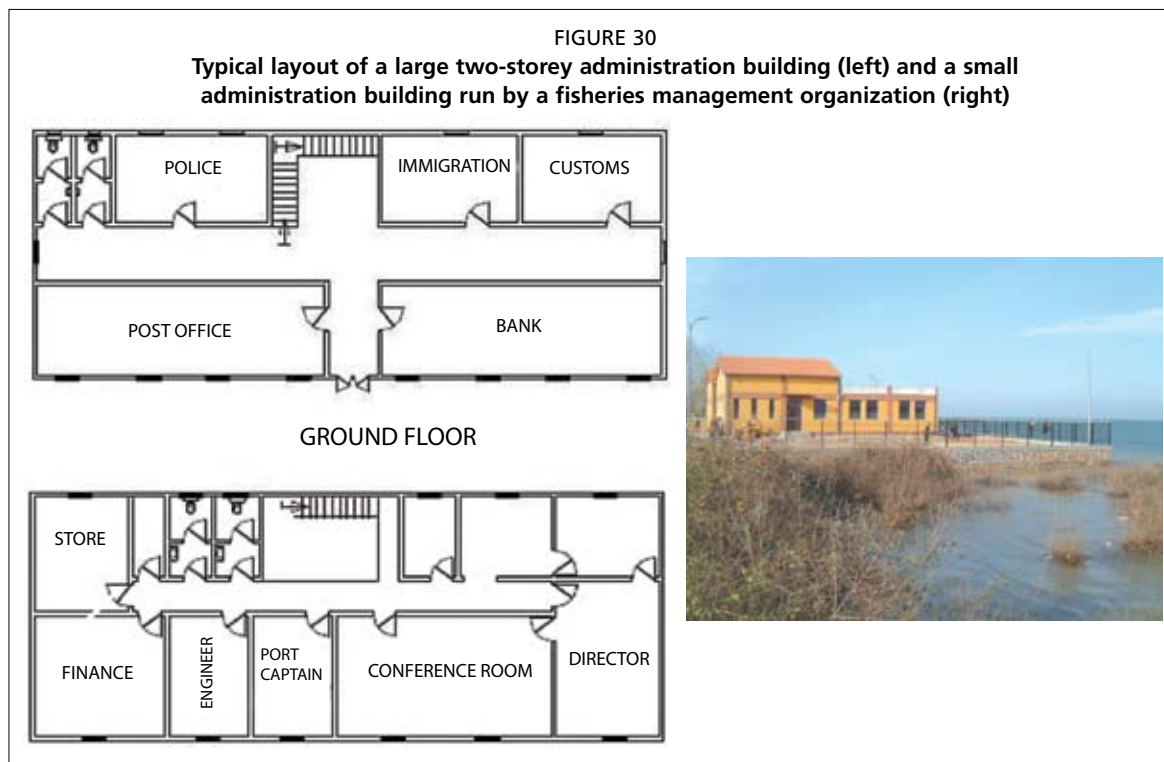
illustrates a typical ground-floor plan for a two-storey building suitable for port administration. The top floor should be reserved for the management staff, whereas the ground floor should include all types of interface services, such as police, customs and immigration, if required, and bank or post office. Office space destined for the installation of MCS radar screens should have adequate air-conditioning facilities.
